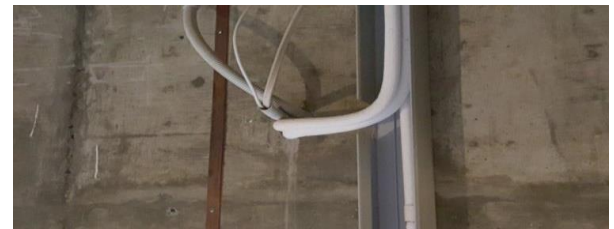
showing poorly installed telecommunication conduits/cables through water reservoir at RFNSA Site No. 4161001 located at Alexandra Hills Reservoir located at 36A Alexandra Circuit, Alexandra Hills Queensland.
